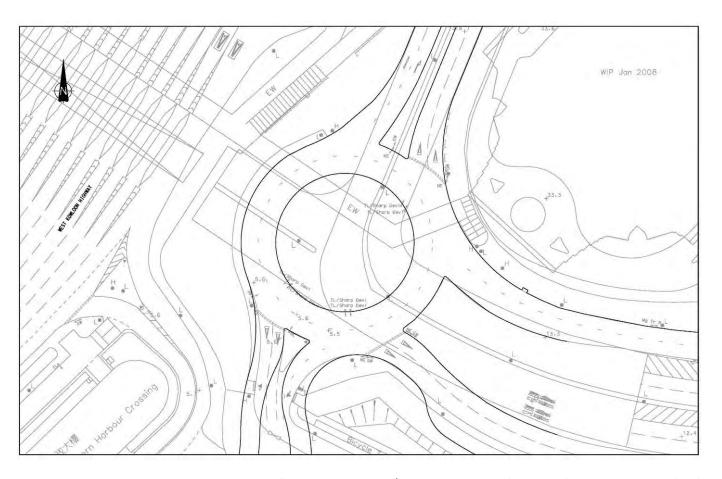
Proposed Junction Layout of Austin Road West/Nga Cheung Road (At-Grade) Access to WKCD (J16)
